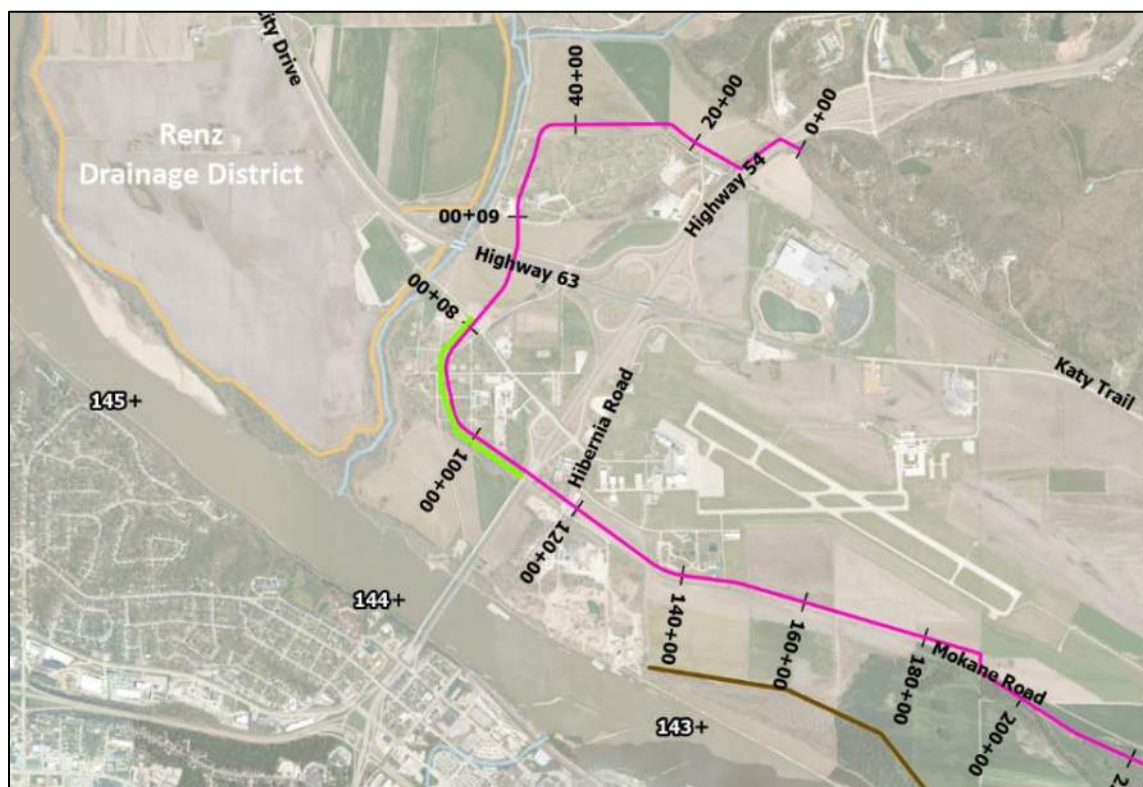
Federal Interest Plan Limits of Riprap Embankment Armor (green line)
